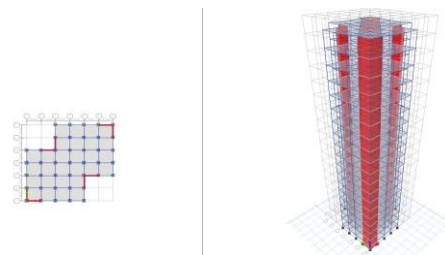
SHEAR WALL AT CORNER FOR IRREGULAR BUILDING
